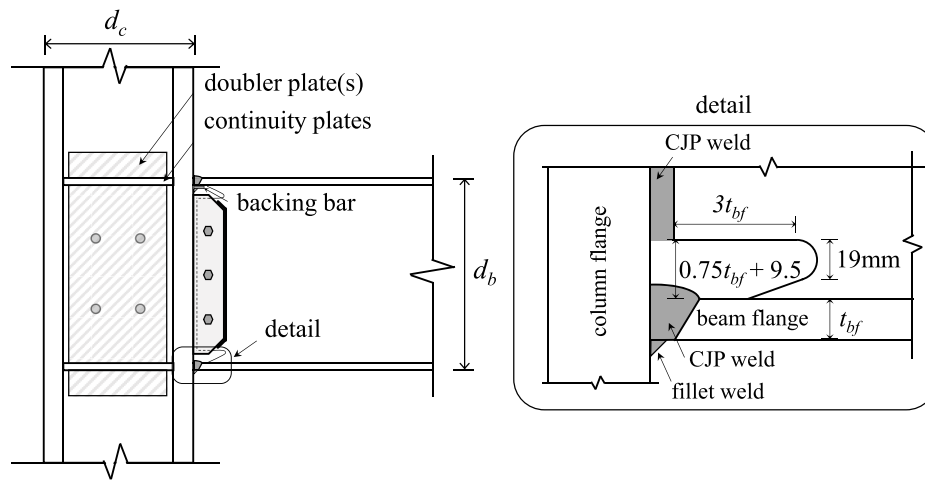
Illustration of typical welded unreinforced flange-welded web connection detailing.
